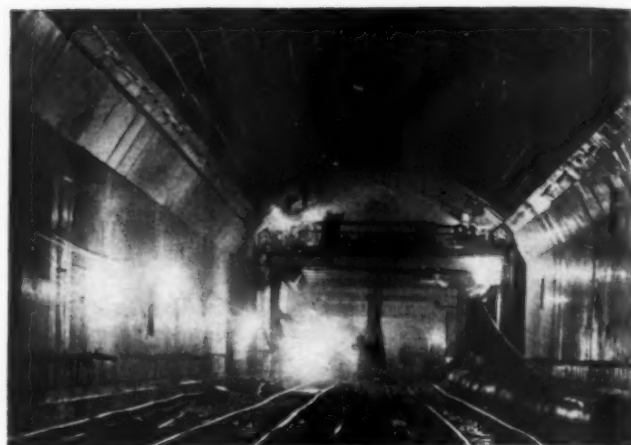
Erecting Arch Forms. Completed Side Walls in Foreground, Allegheny Mountain Tunnel
